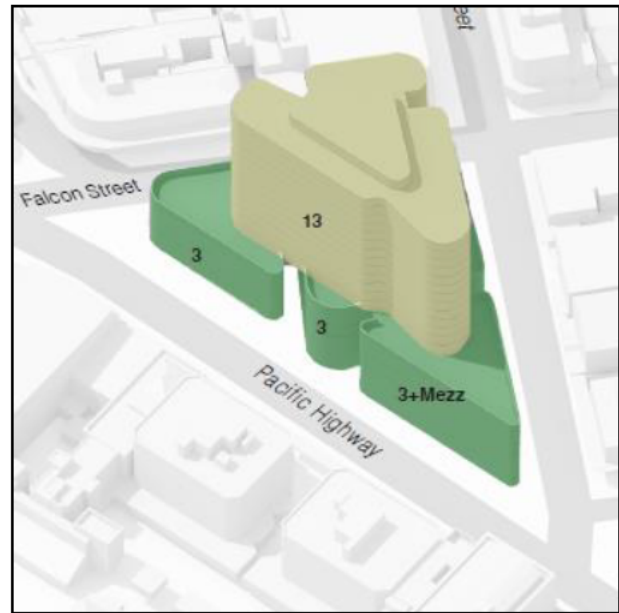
Proposed built form with the podium mezzanine at the intersection of Pacific Highway and Alexander Street (source: Turner)
